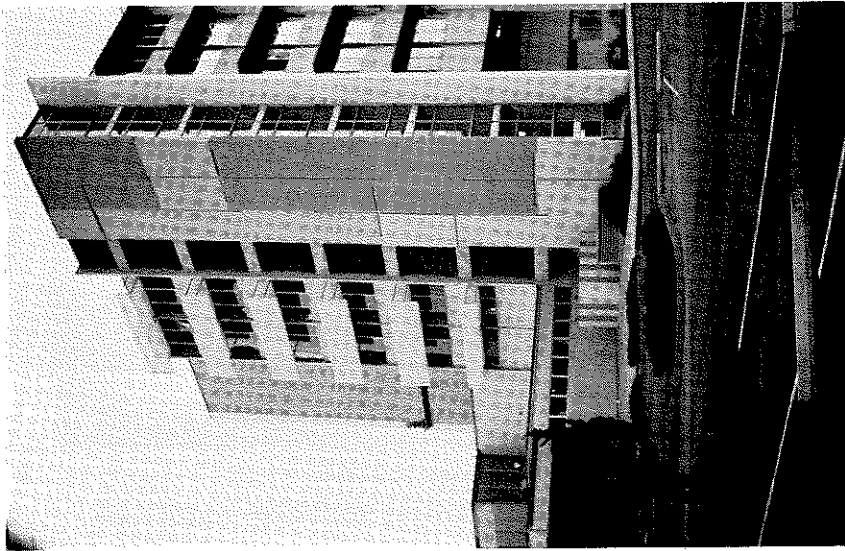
Holy Cross Hospital showing fractured end wall at the fourth floor construction joint.
